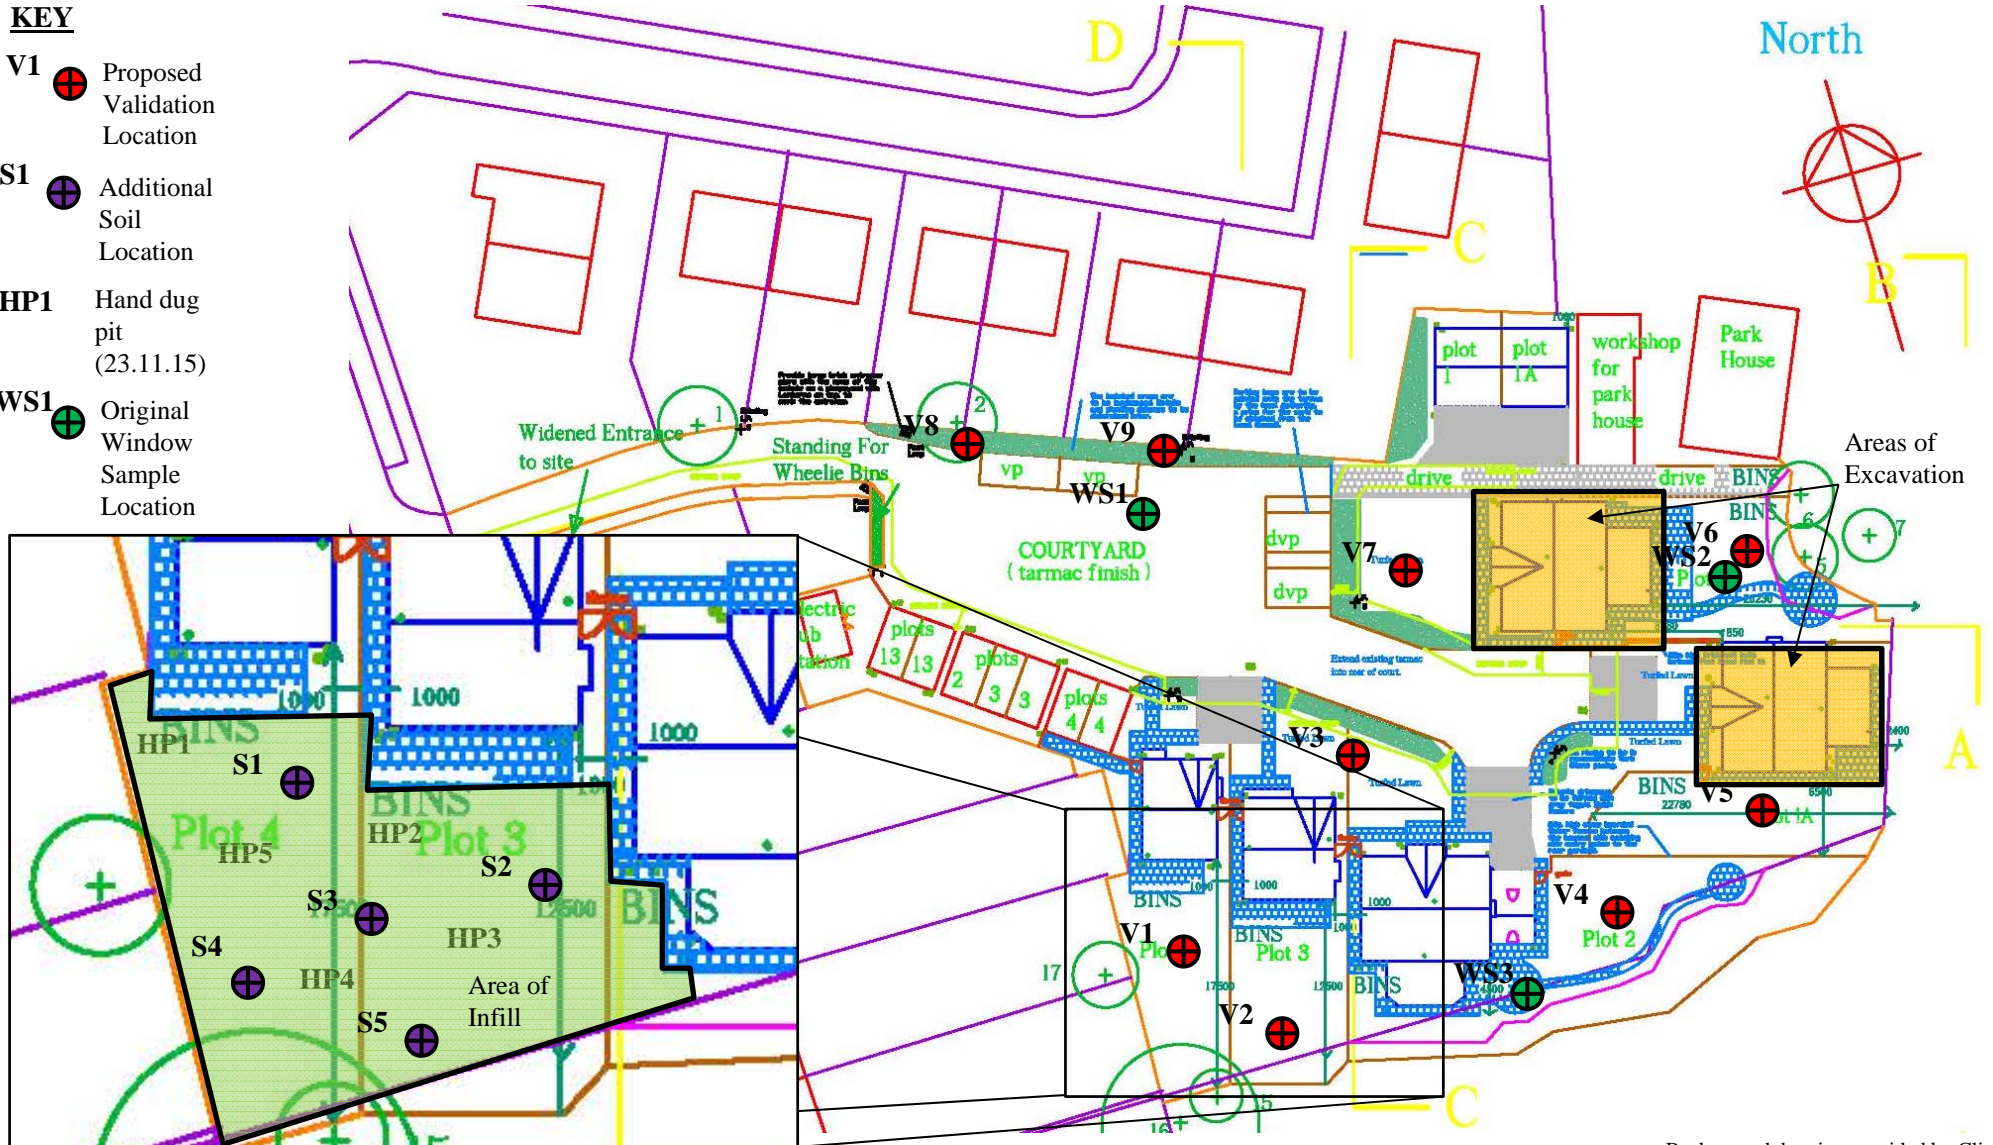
Site Plan (from Detailed Remediation Strategy)
